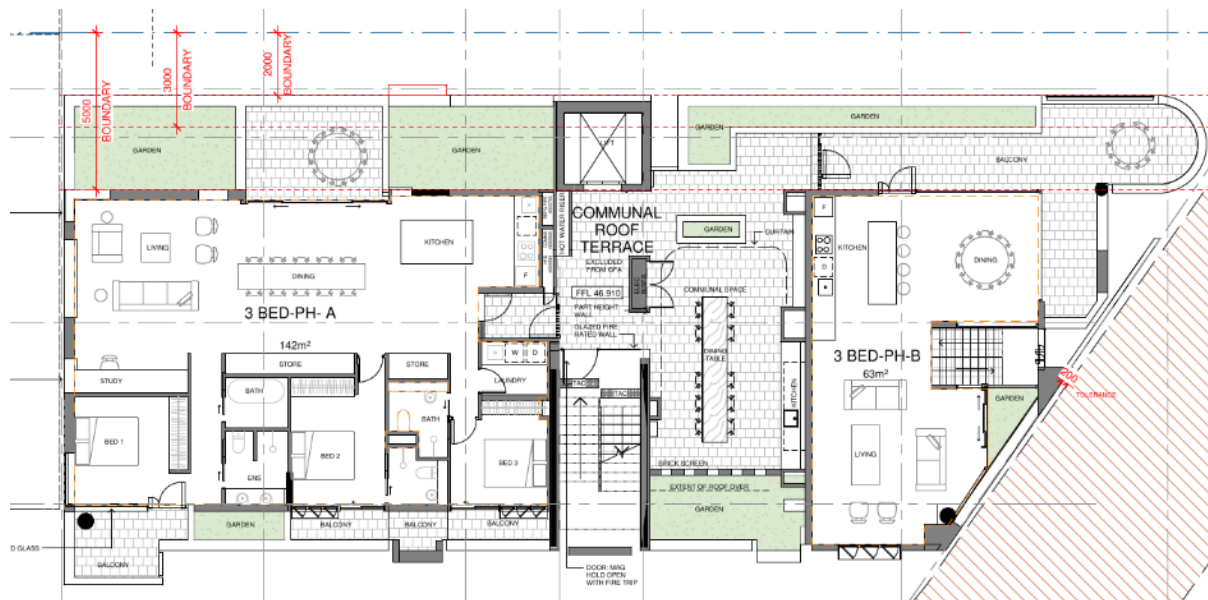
Level 6 plan: Young Street North Building, including communal private open space
